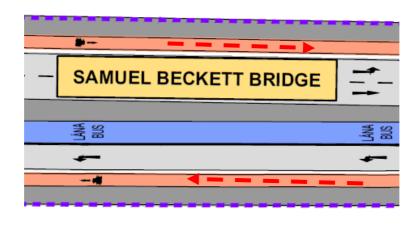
EPR proposal at Samuel Beckett Bridge east side: one-way cycle tracks
